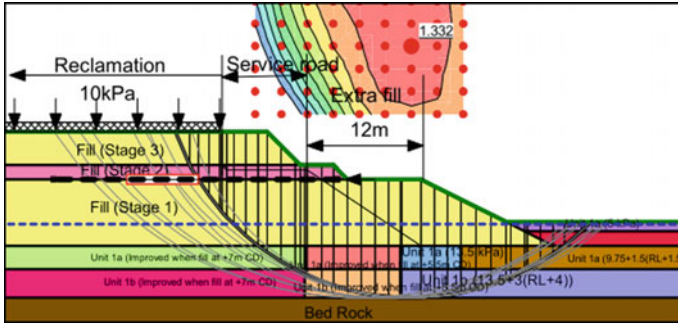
Slope stability model for +10.5 mCD level fill (circular failure)
